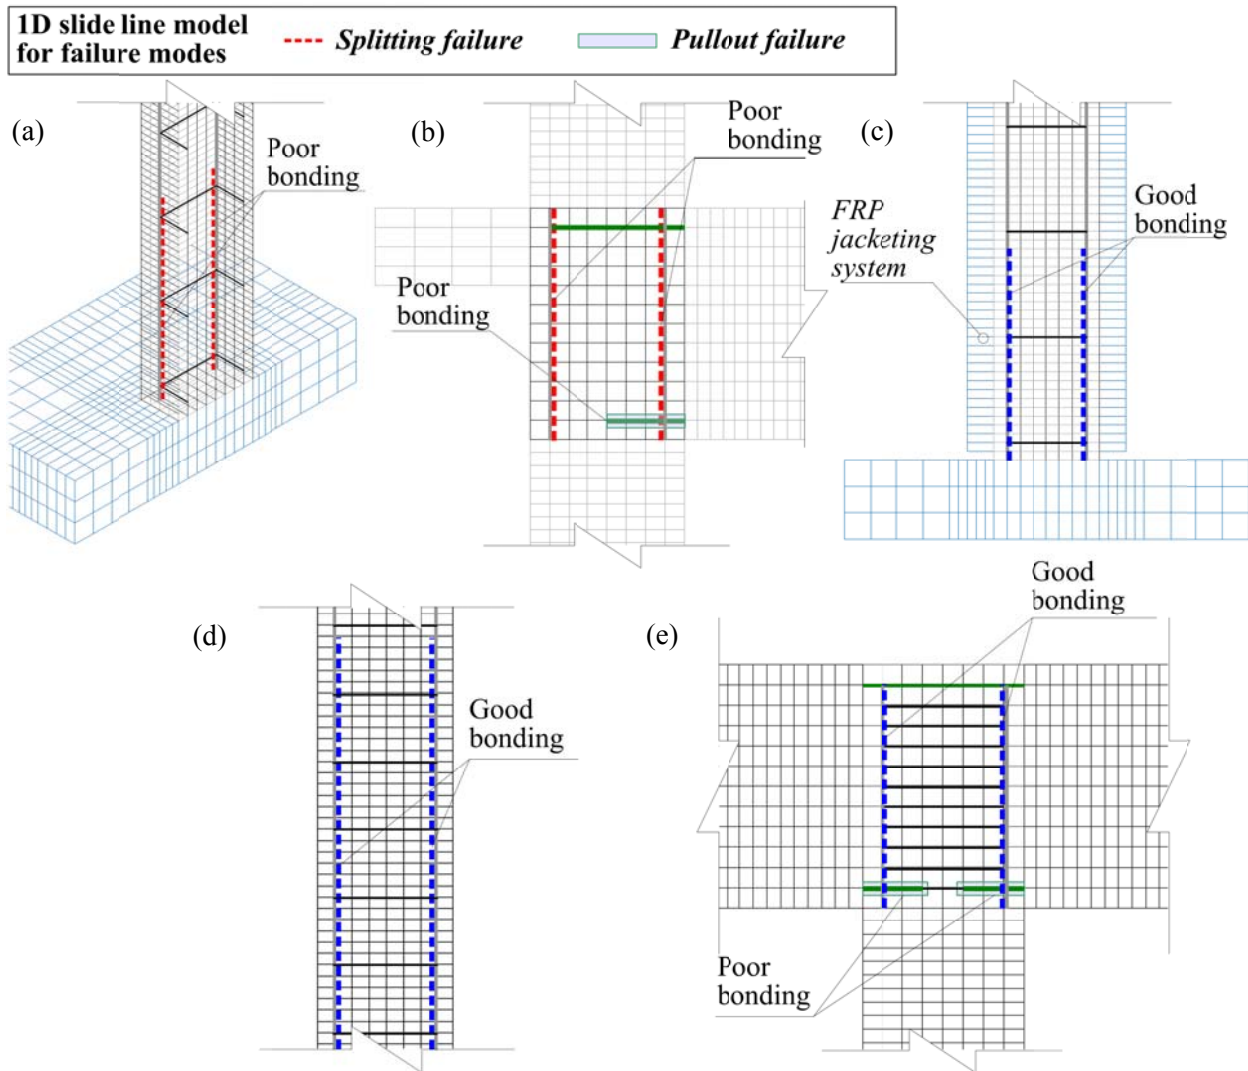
Examples of bond-slip modeling for failure modes and bonding conditions in LS-DYNA: (a) first story as-built column; (b) first story exterior beam-column joint; (c) first story retrofitted column; (d) second story column; and (e) second story interior beam-column joint
